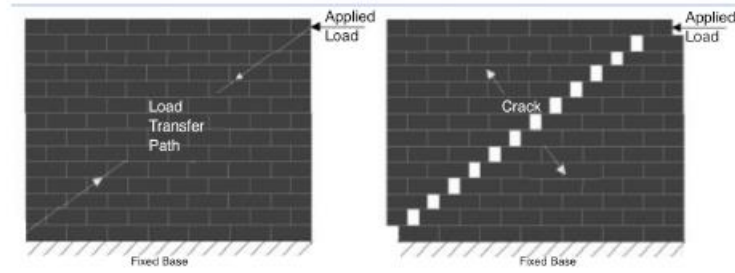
Diagonal Shear Crack in wall follow load transfer path
